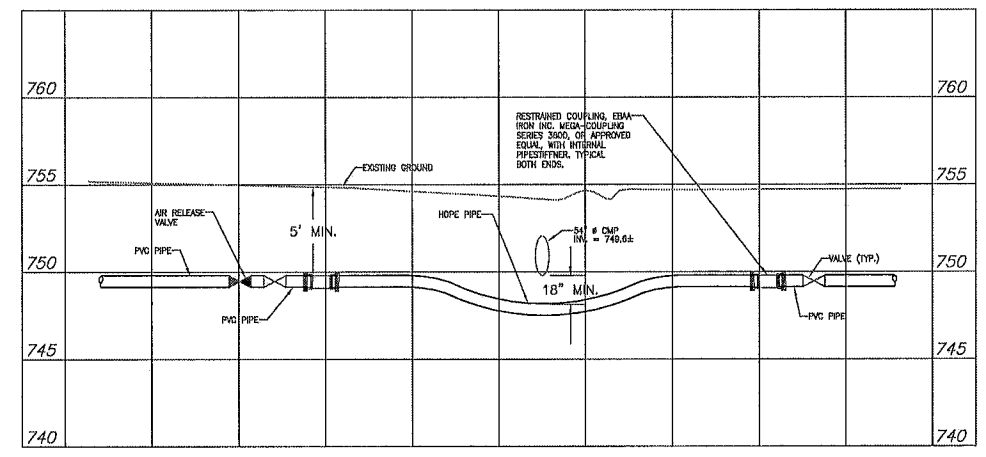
HORIZONTAL DIRECTIONAL DRILL UNDER OLD US HIGHWAY 31 AT CR E350N
